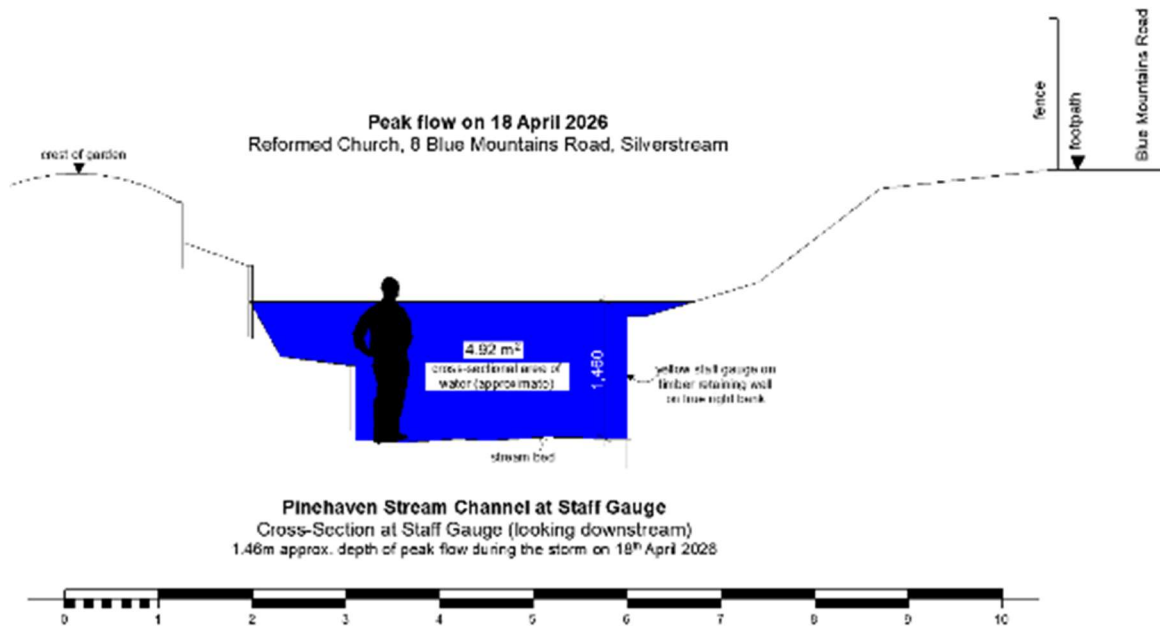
Cross-Section of Channel at Staff Gauge, 8 Blue Mountains Road
